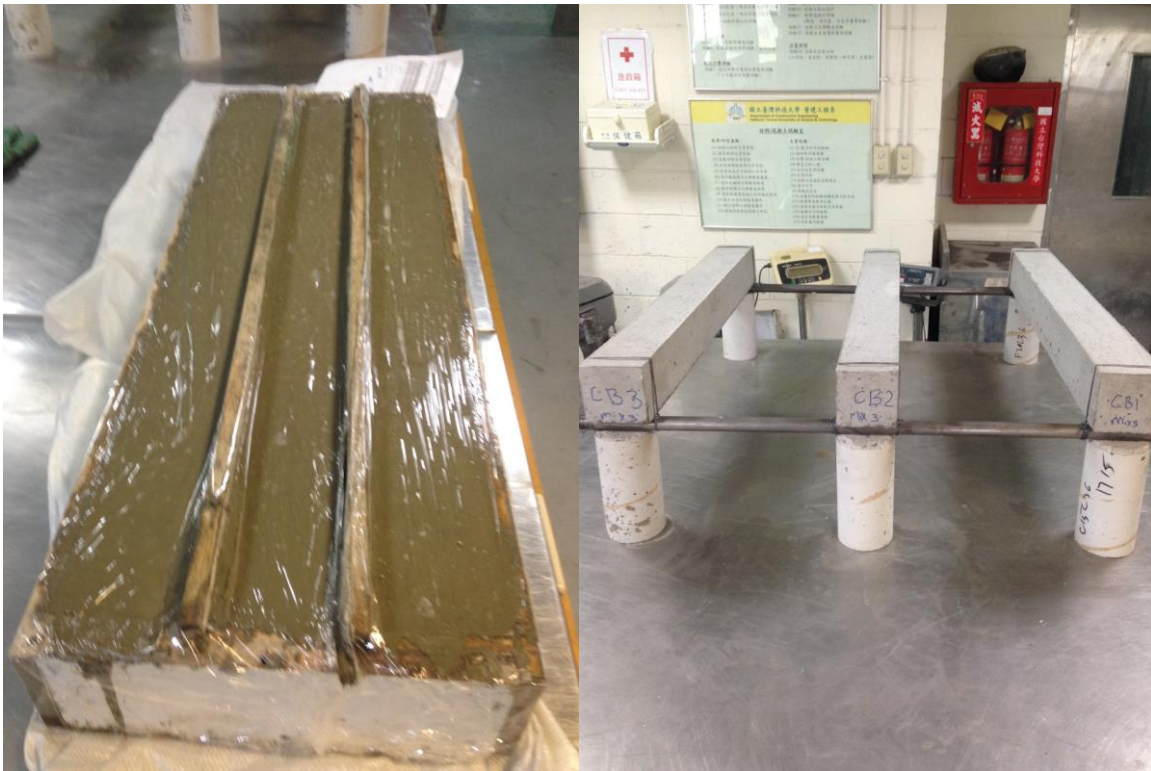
Timoshenko type concrete beams (100×100×1000 mm)
